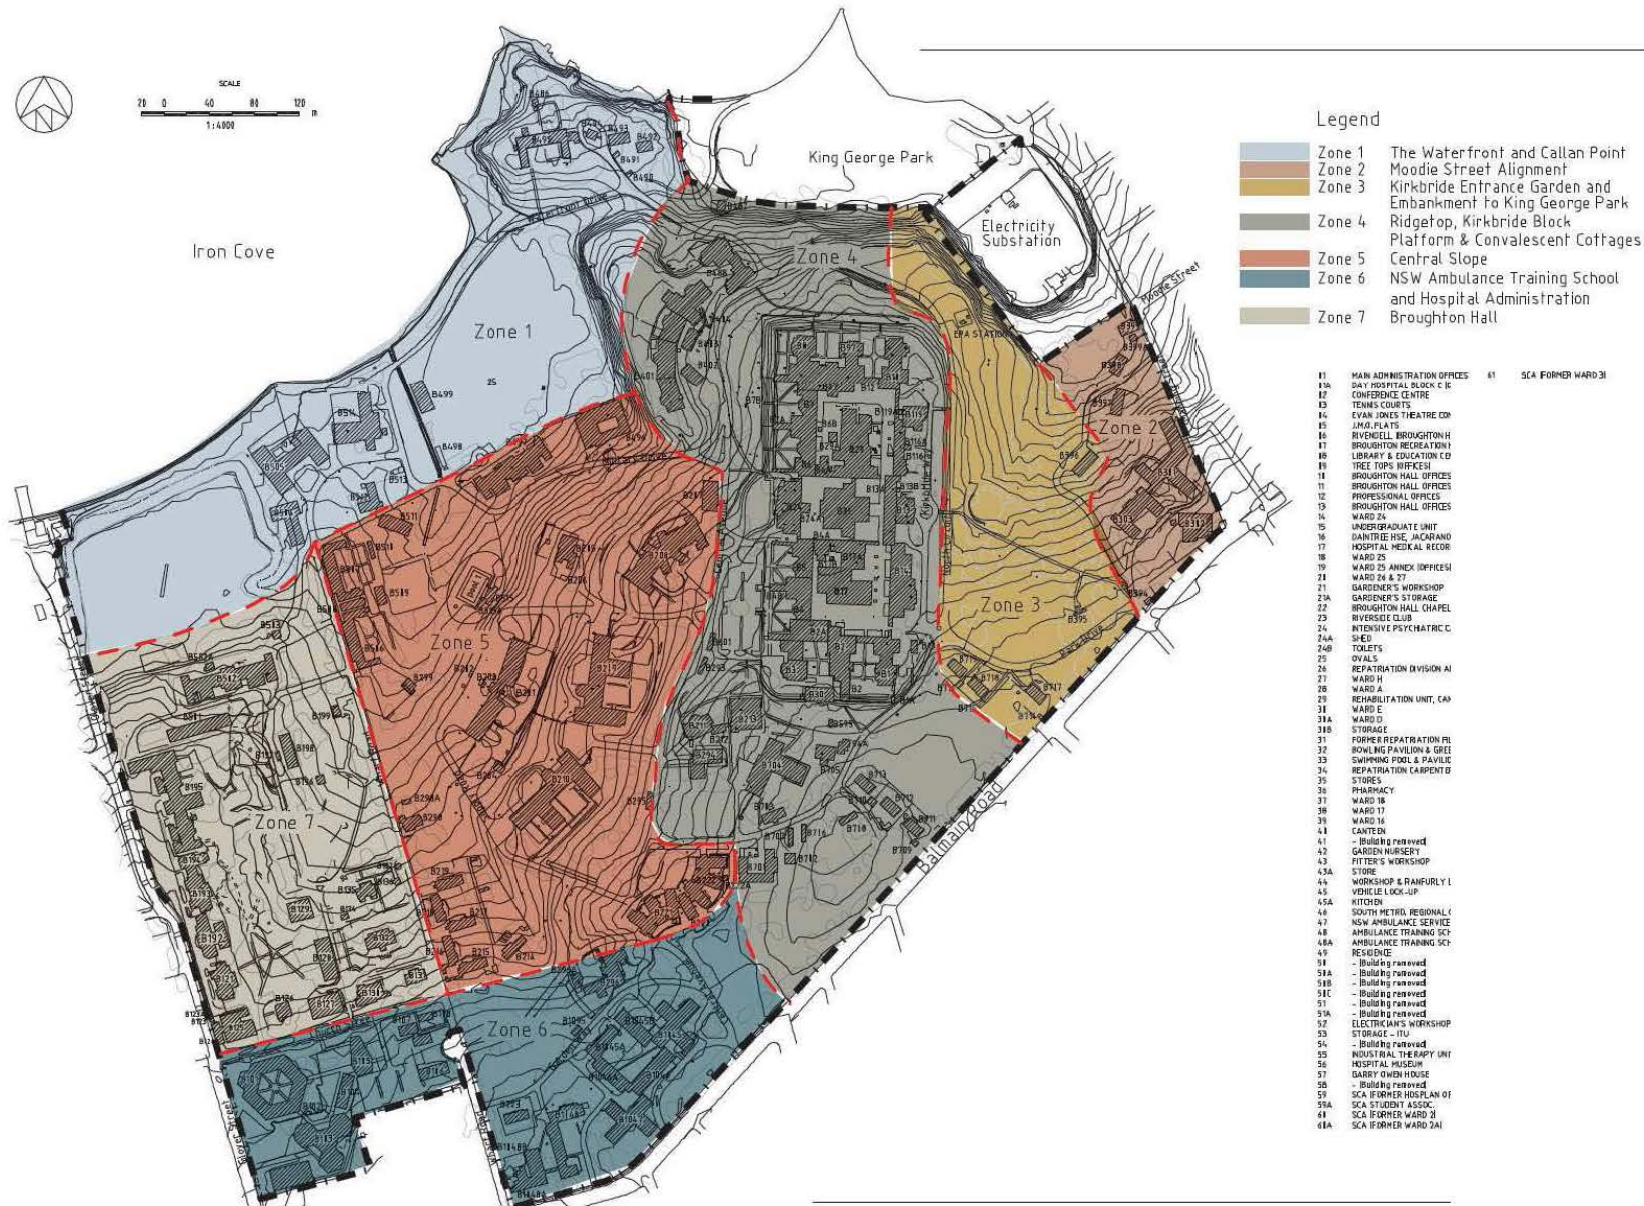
Site Plan with Study Zones (Tanner Architects)
